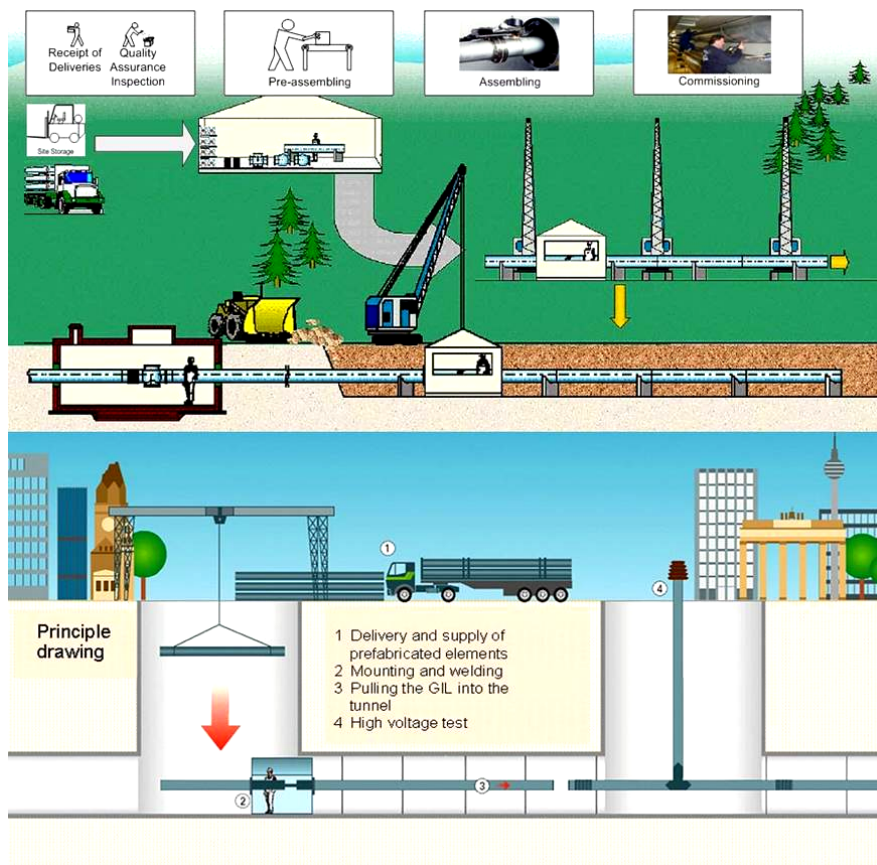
Site logistics scheme for GIL installation in tunnel, above and below ground
